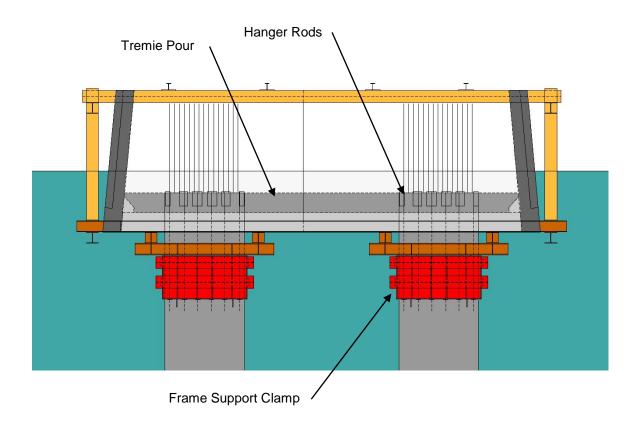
Precast Concrete Pier Box Cofferdam Installation
